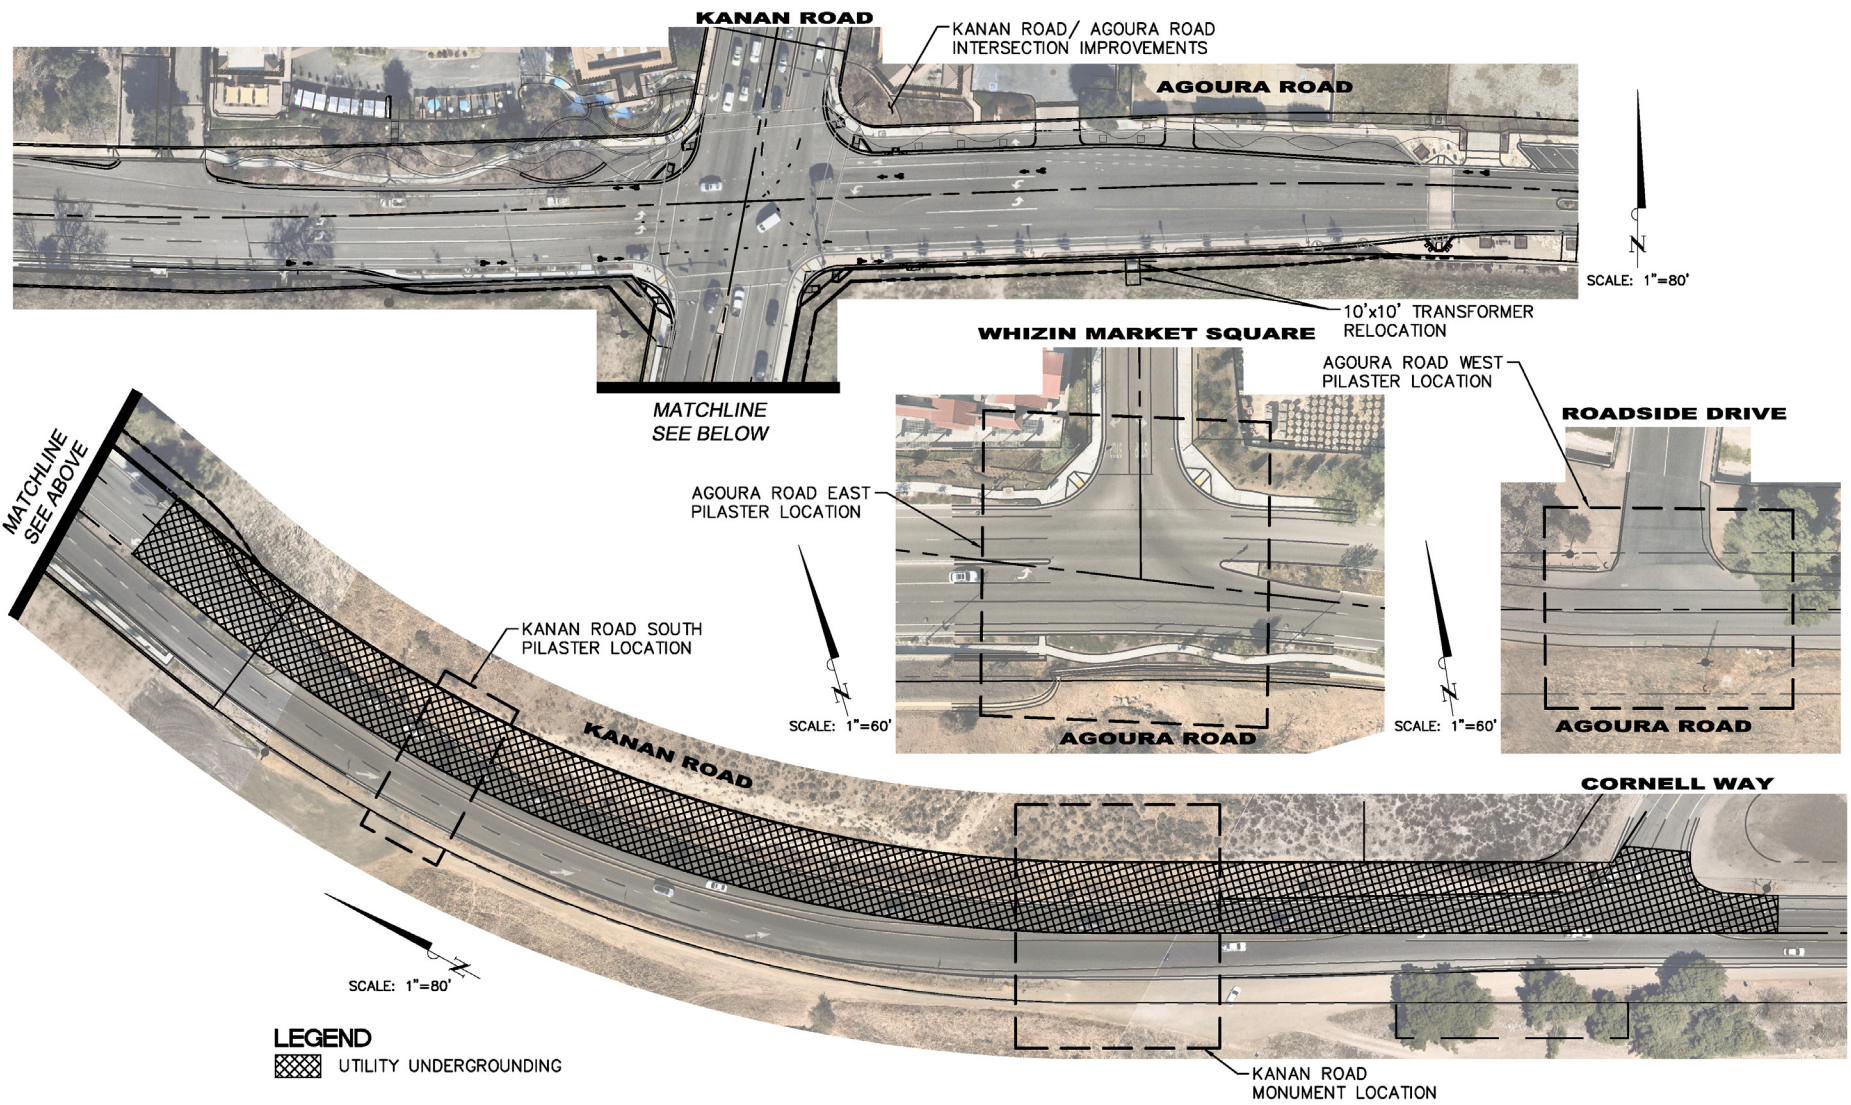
B: PROPOSED KANAN ROAD/AGOURA ROAD INTERSECTION IMPROVEMENTS
